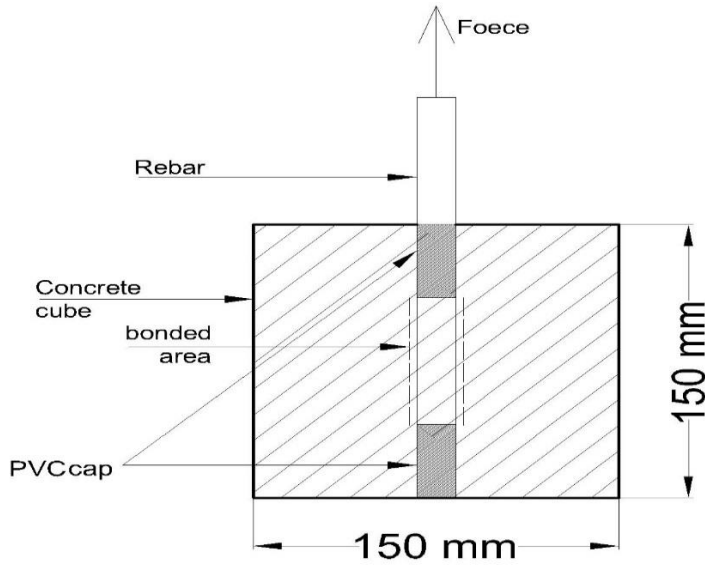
Details of reinforcement of Cubes for pull – out testing.
